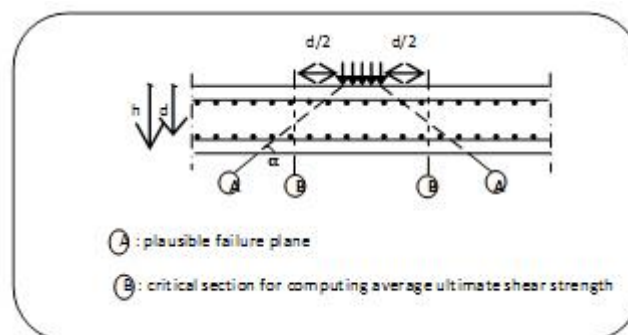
Cross section of slab-column connection showing critical section at distance  $d/2$  from column face to intersect most plausible failure planes (angle  $\alpha$  ranges between 30 and 45 degrees)
